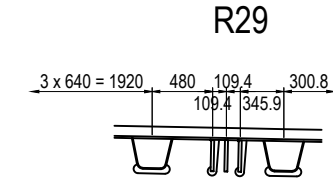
DETAIL OF CROSS BEAM SECTION (17) S=1:60
